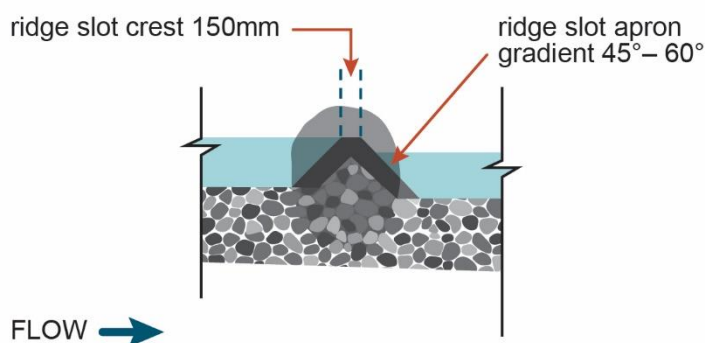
Interim rock ramp fishway showing ridge detail (long-section of waterway) – amber and green waterways
